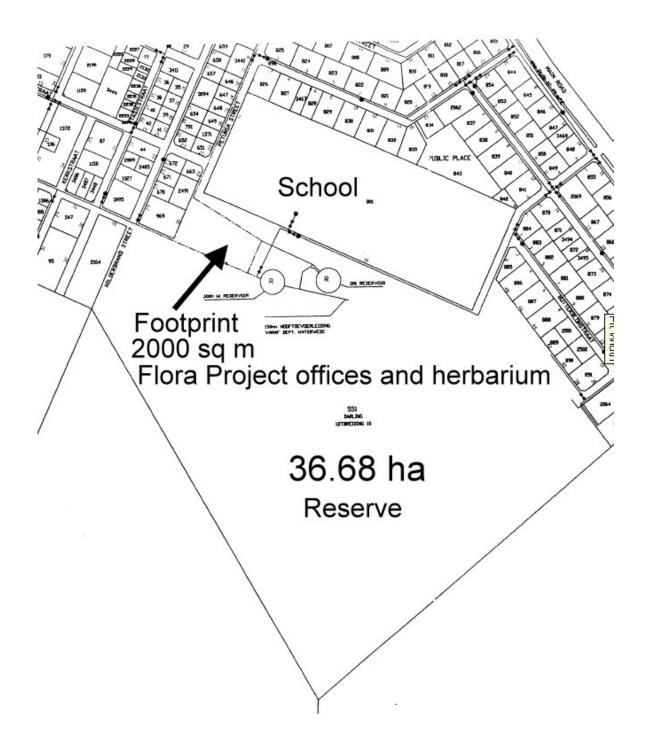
Architect's plan of the reserve showing the position of the Flora Project building in relation to the school and town housing. The circular structures are unsightly but prominent cement reservoirs (Figure 3).
